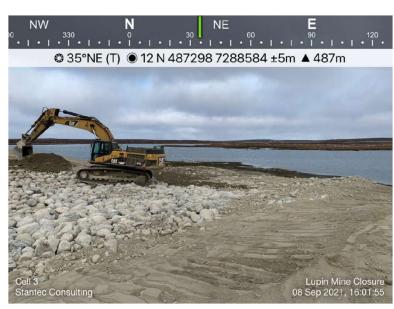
Construction of the Cell 3 outlet with fill to meet design grade.
